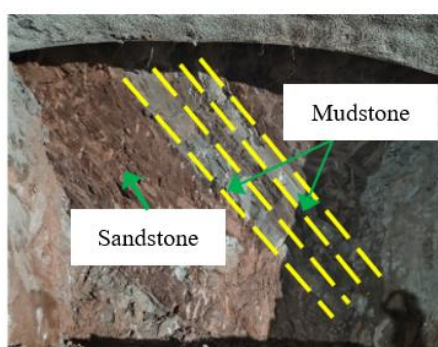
Joint Condition of rock mass in the on-site tunnel
